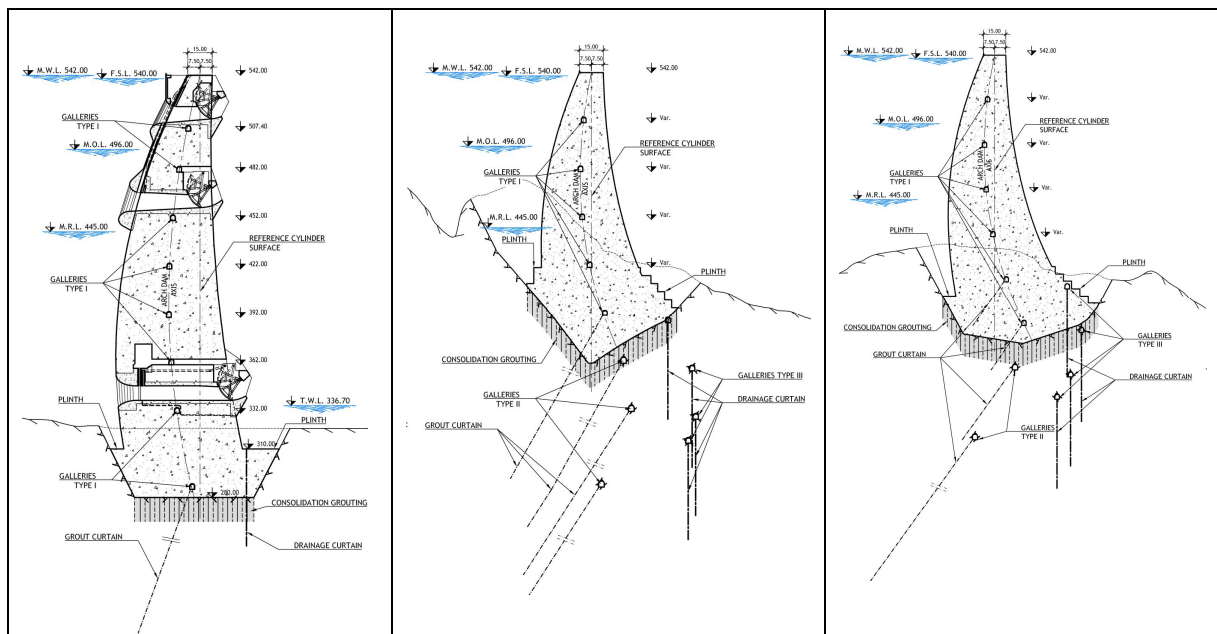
3 Views of typical sections through the dam and its foundation
